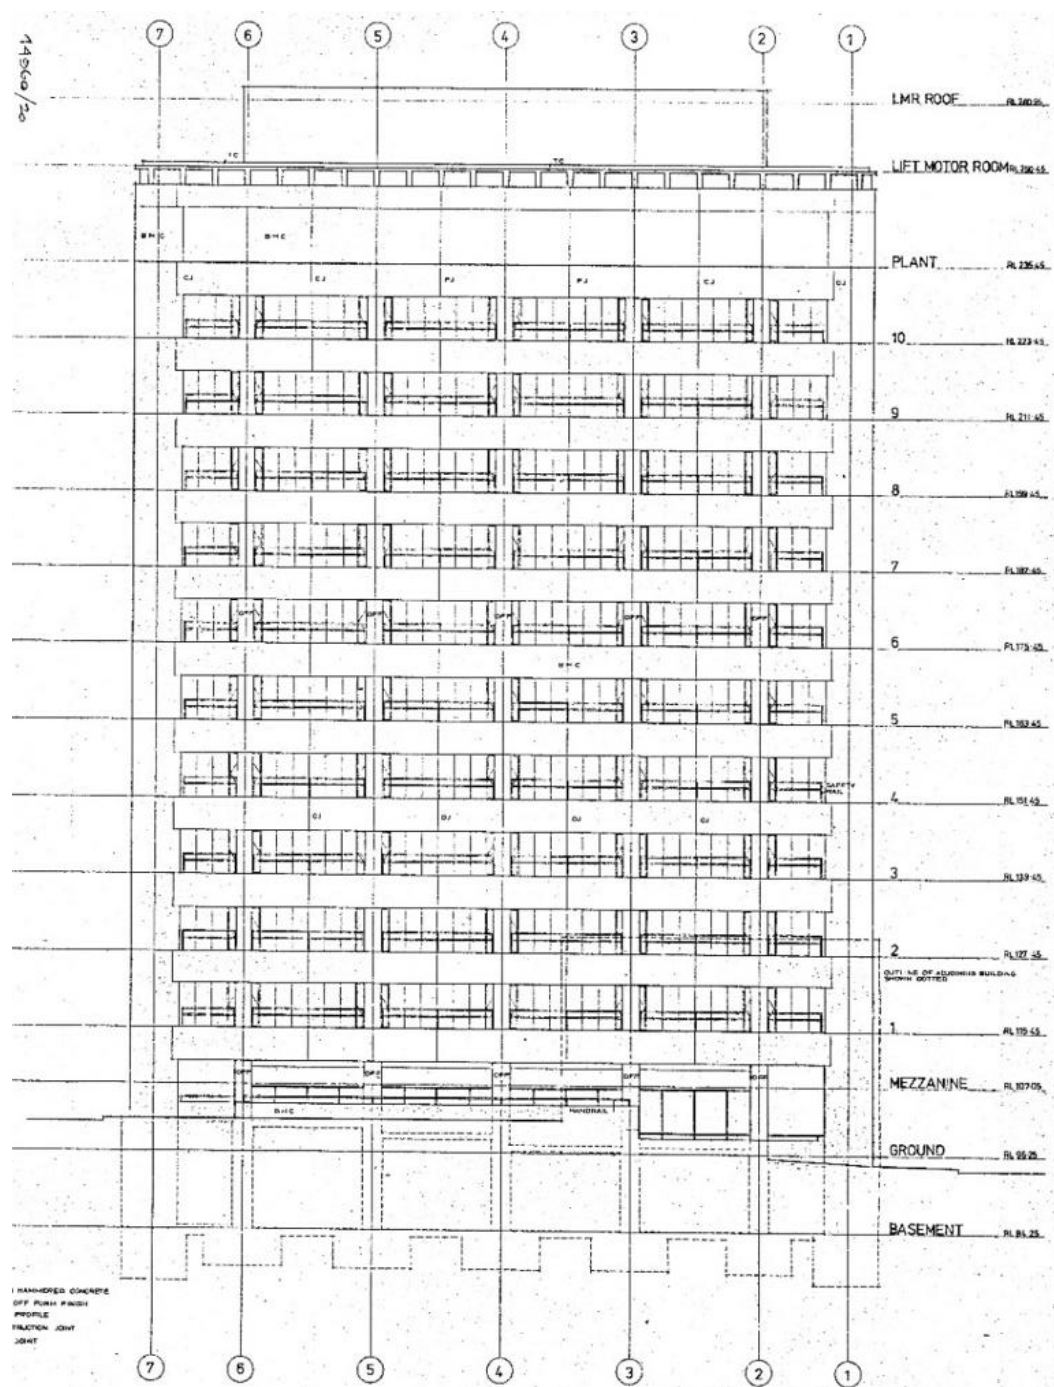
Architectural drawing of the north elevation, dated 1975 (BAP).
